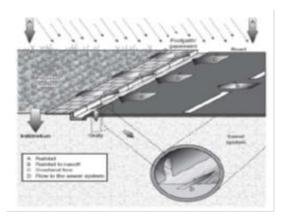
Methods of road drainage (Butlers and Davies, 2004).
